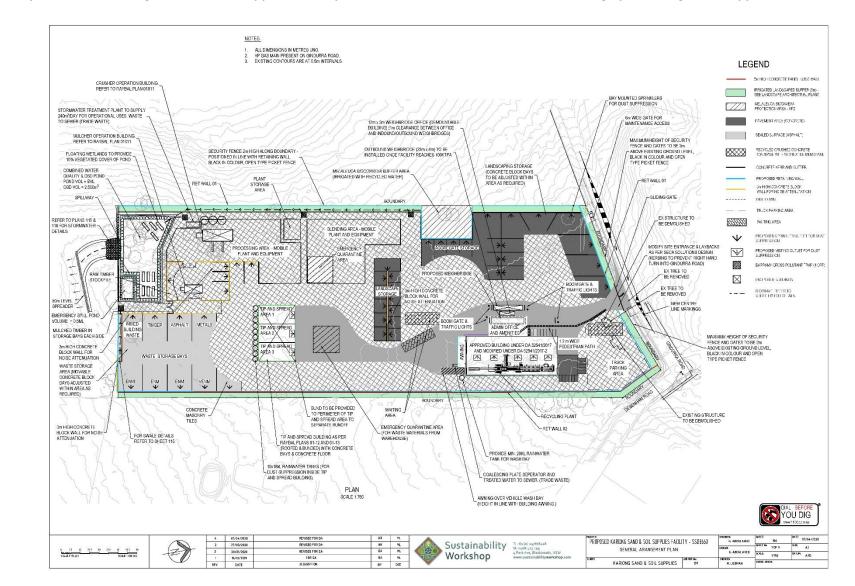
Site layout for the Kariong Sand and Soil Supplies development. Note that detailed site and civil design plans are given in Appendix E.
